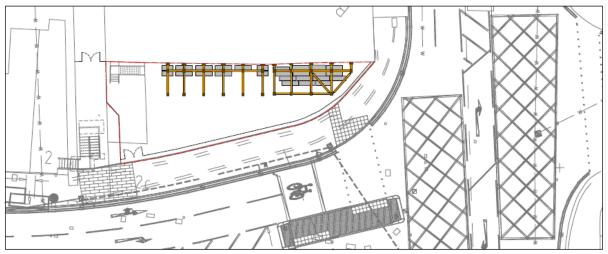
"As existing" plan of the site, showing new junction and propping system in place against neighbouring building.
